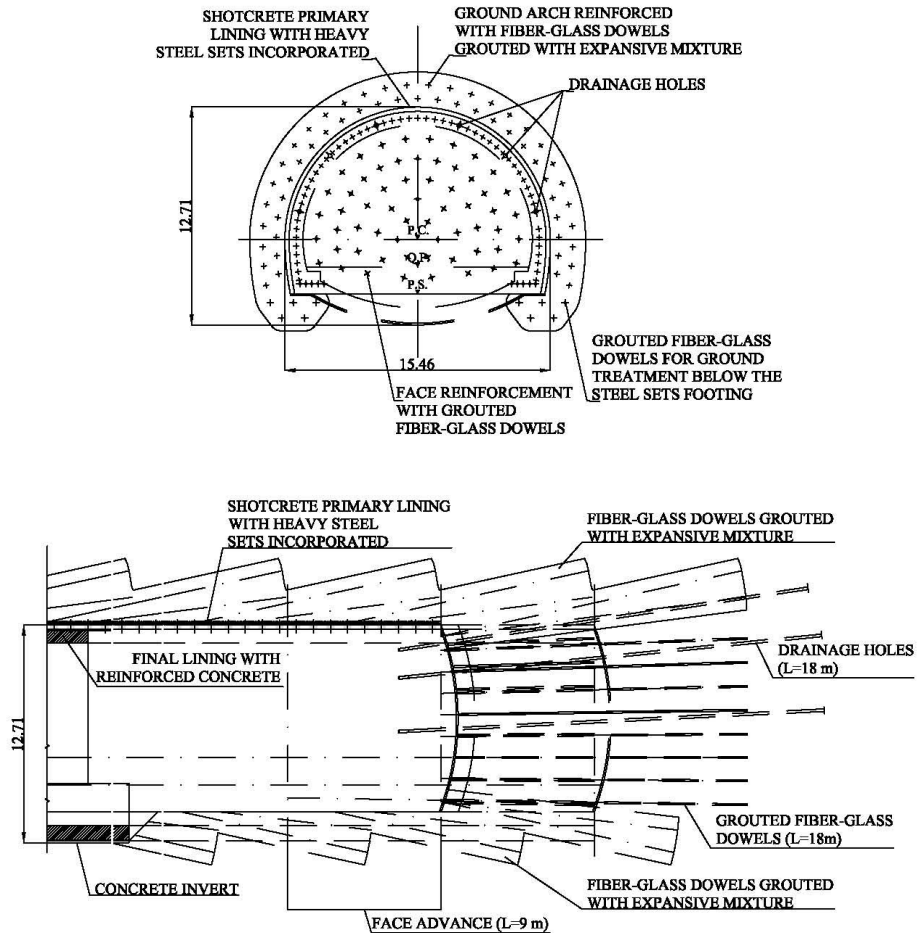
Typical face reinforcement system used with the full face method. Cross section (above) and Longitudinal Section (below). Schematic drawings only, not to scale.
